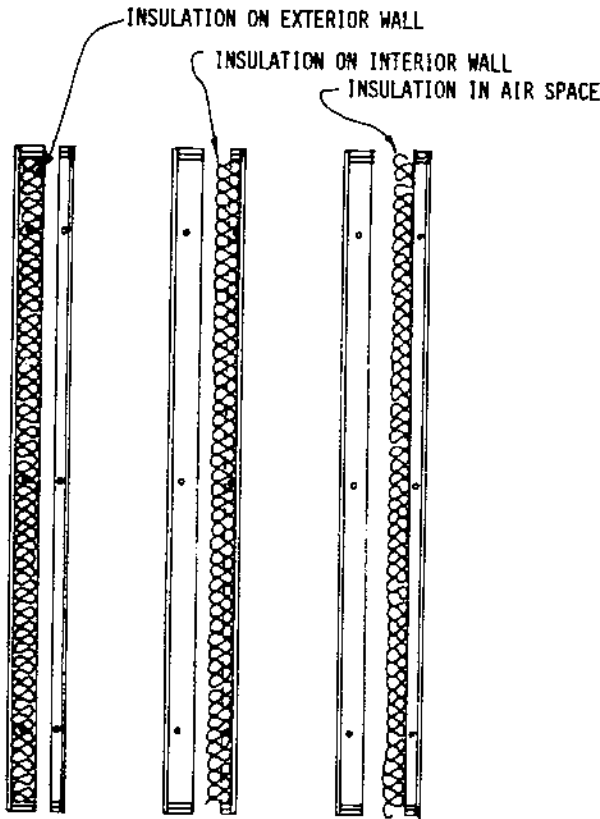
Cross section of exterior wall showing variations in insulation placement.
